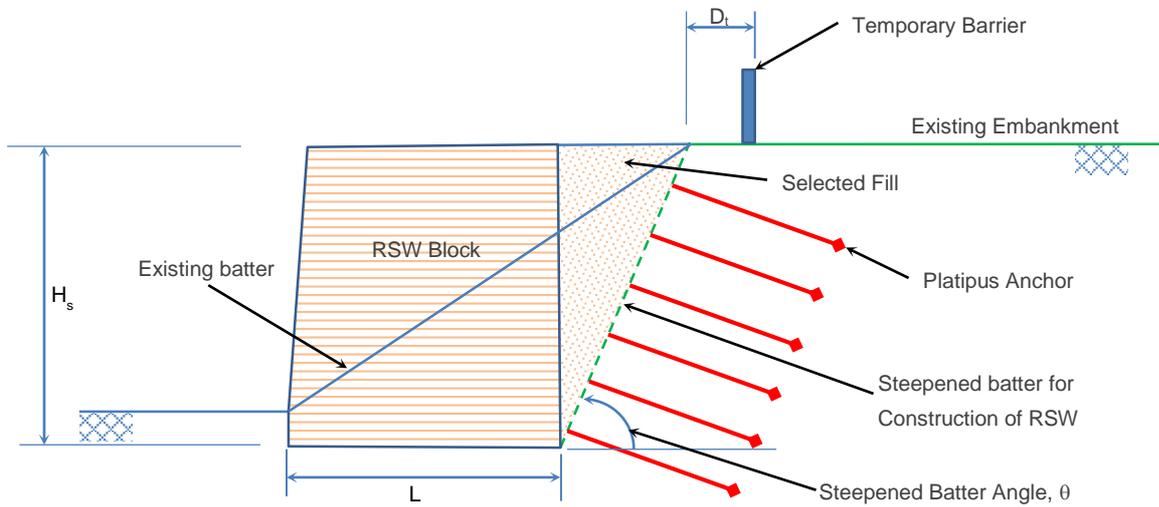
Layout of Temporary Excavations and Anchor Arrangements
